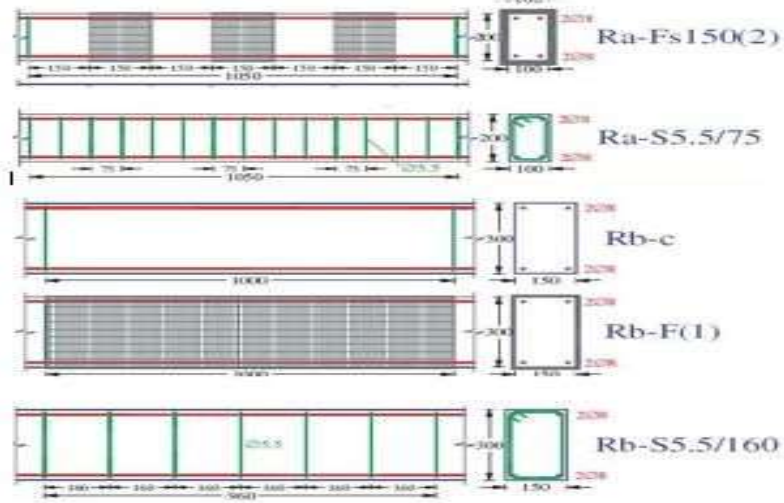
Geometry and reinforcement arrangement of the tested specimens²⁴
